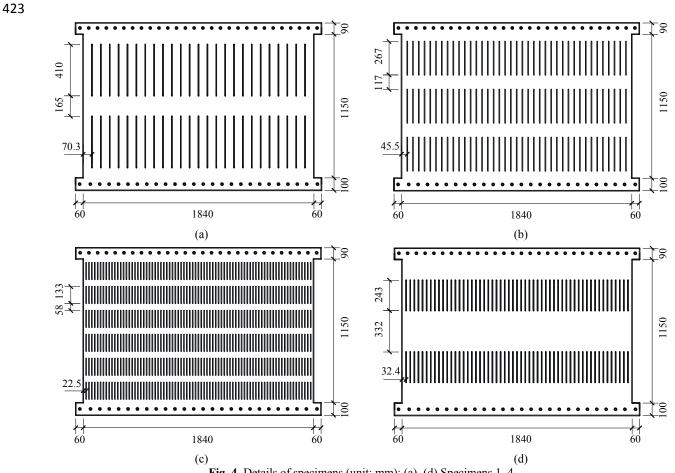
Details of specimens (unit: mm): (a)-(d) Specimens 1-4
